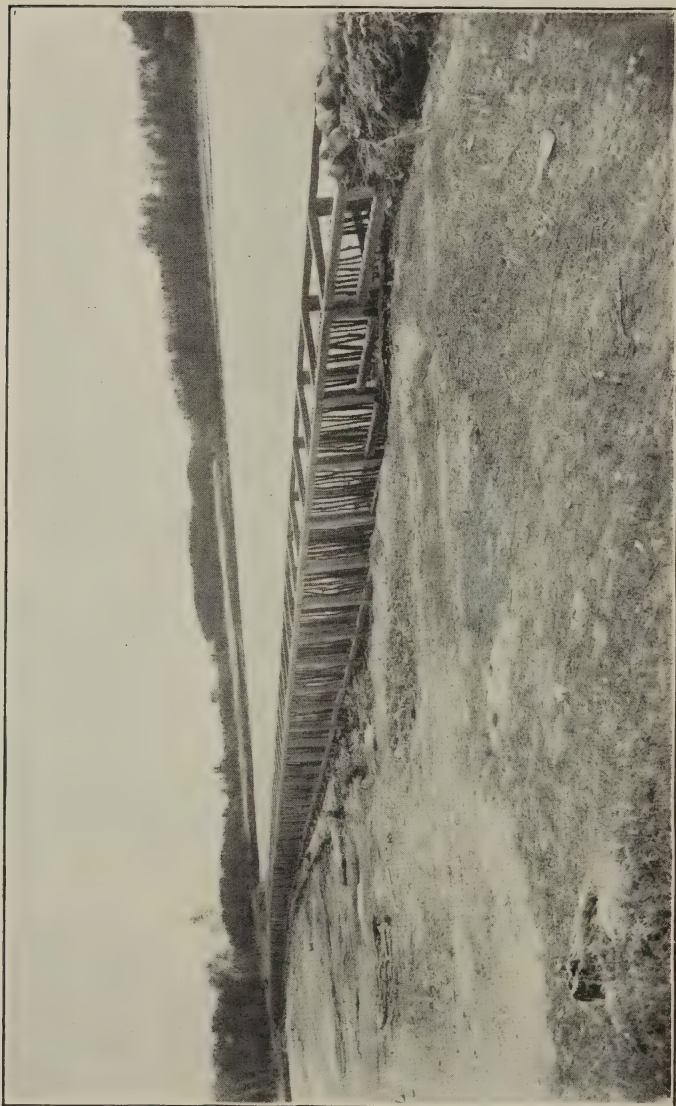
Upper concrete dike, Fort Riley, Kans.; 1,100 feet. Looking downstream from land side.
